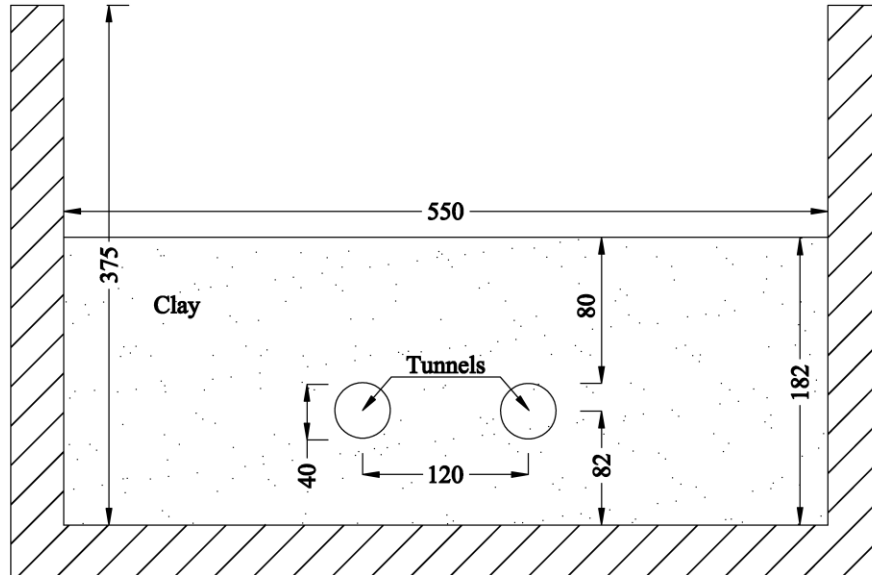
Section through centrifuge model showing a twin-tunnel arrangement (dimensions in mm)
